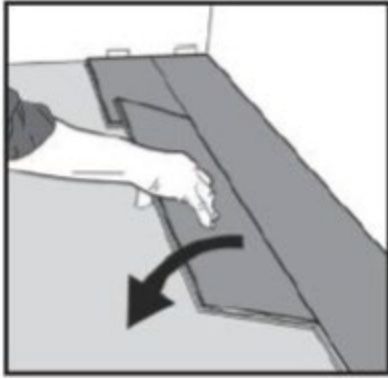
As the board flattens itself to the floor, press or gently tap the top of the short end of the installed panel until it is locked. It is recommended that a soft face rubber mallet be used for tapping. The product is properly locked when the two boards are flush across the top. Finish installing this plank by tapping it with a tapping block on the long side to ensure secure installation.
